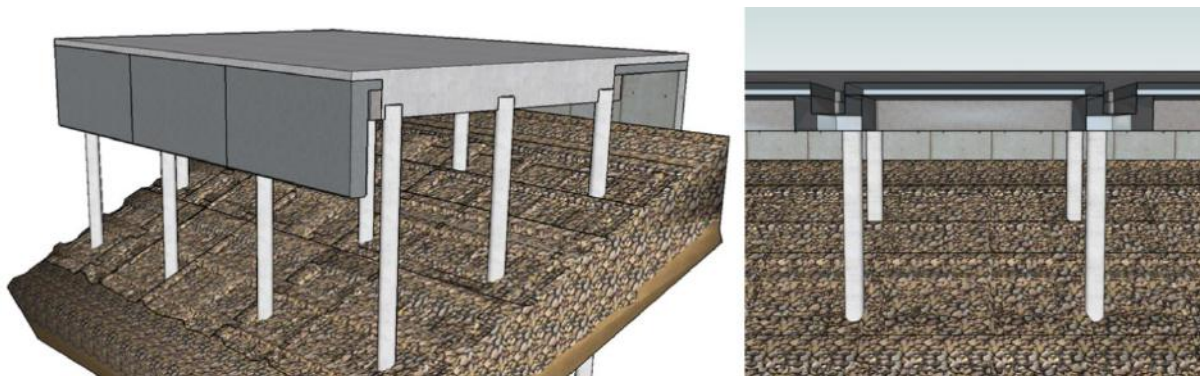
Proposed quay structure, side elevation (left) and front cross section (right)
